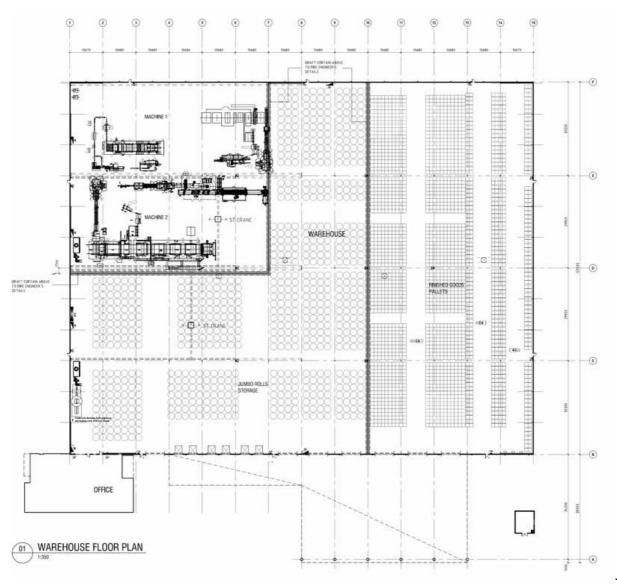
Solaris Paper Facility Warehouse Fitout Plan
